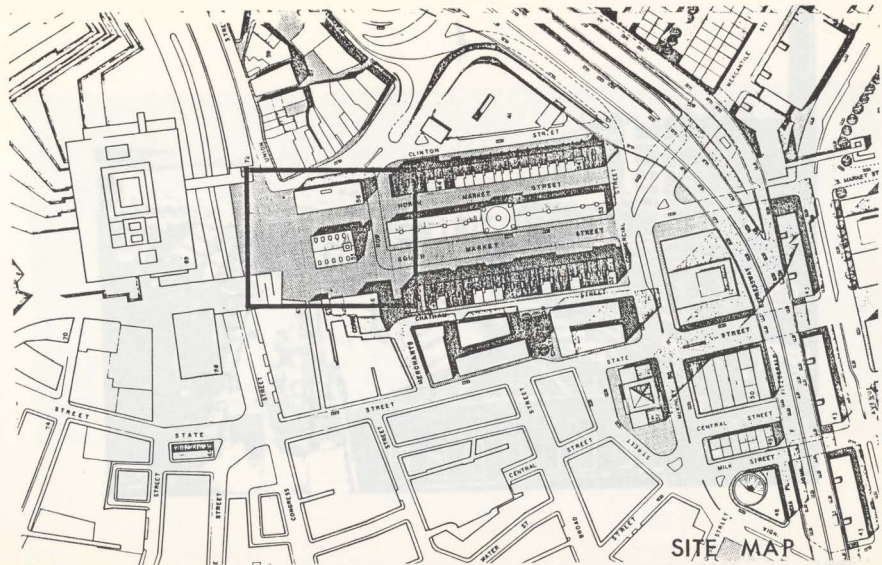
Site Plan of Faneuil Hall Markets, 1968.
